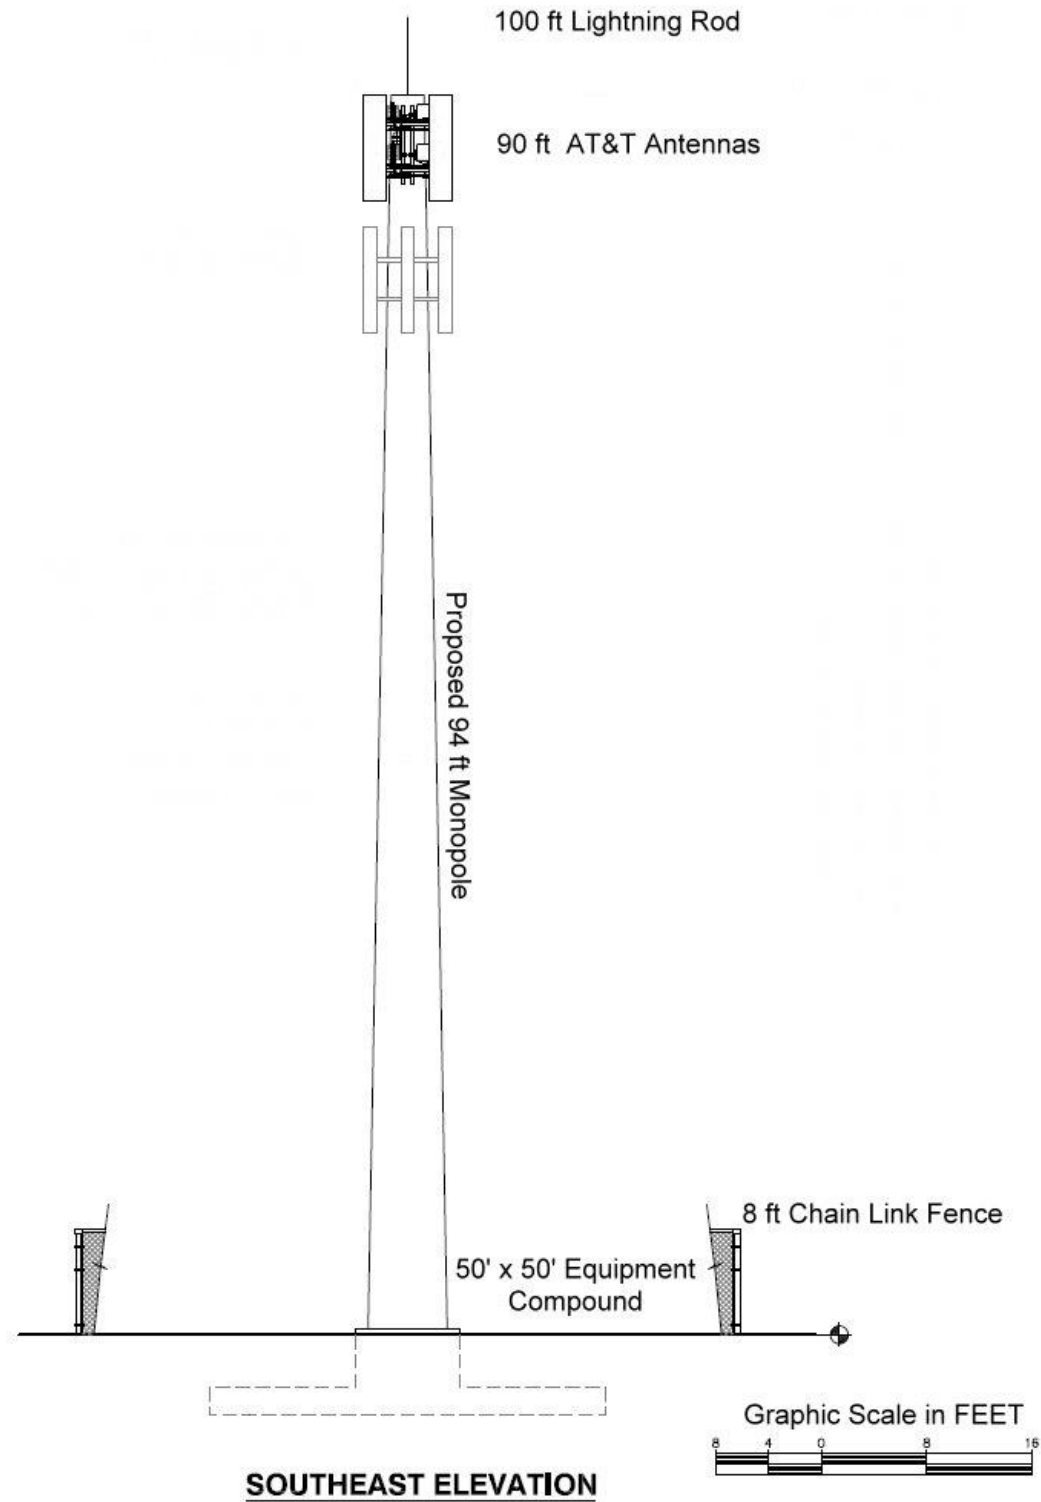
Plan Showing the Proposed Elevation Character of the Project
